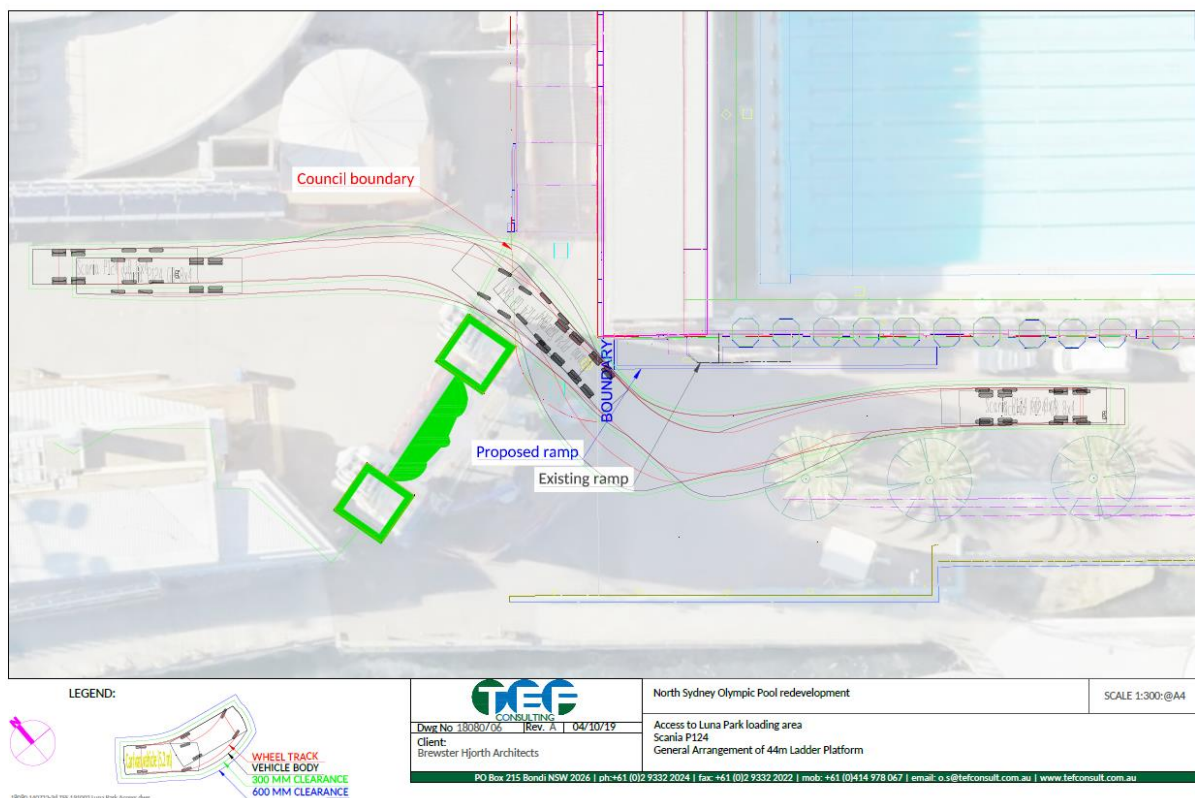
Current Truck turning plan “Bronto” Scania P124 Vehicle with a 44m ladder - access to Luna Park – over Council land.
